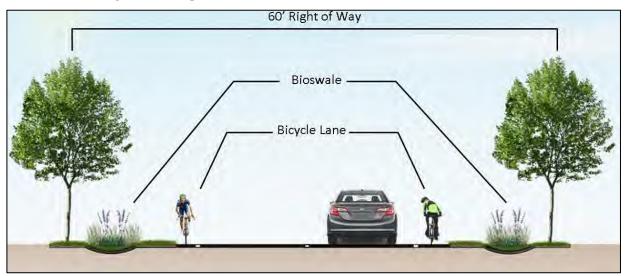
Proposed Interior Subdivision Road Cross Section
